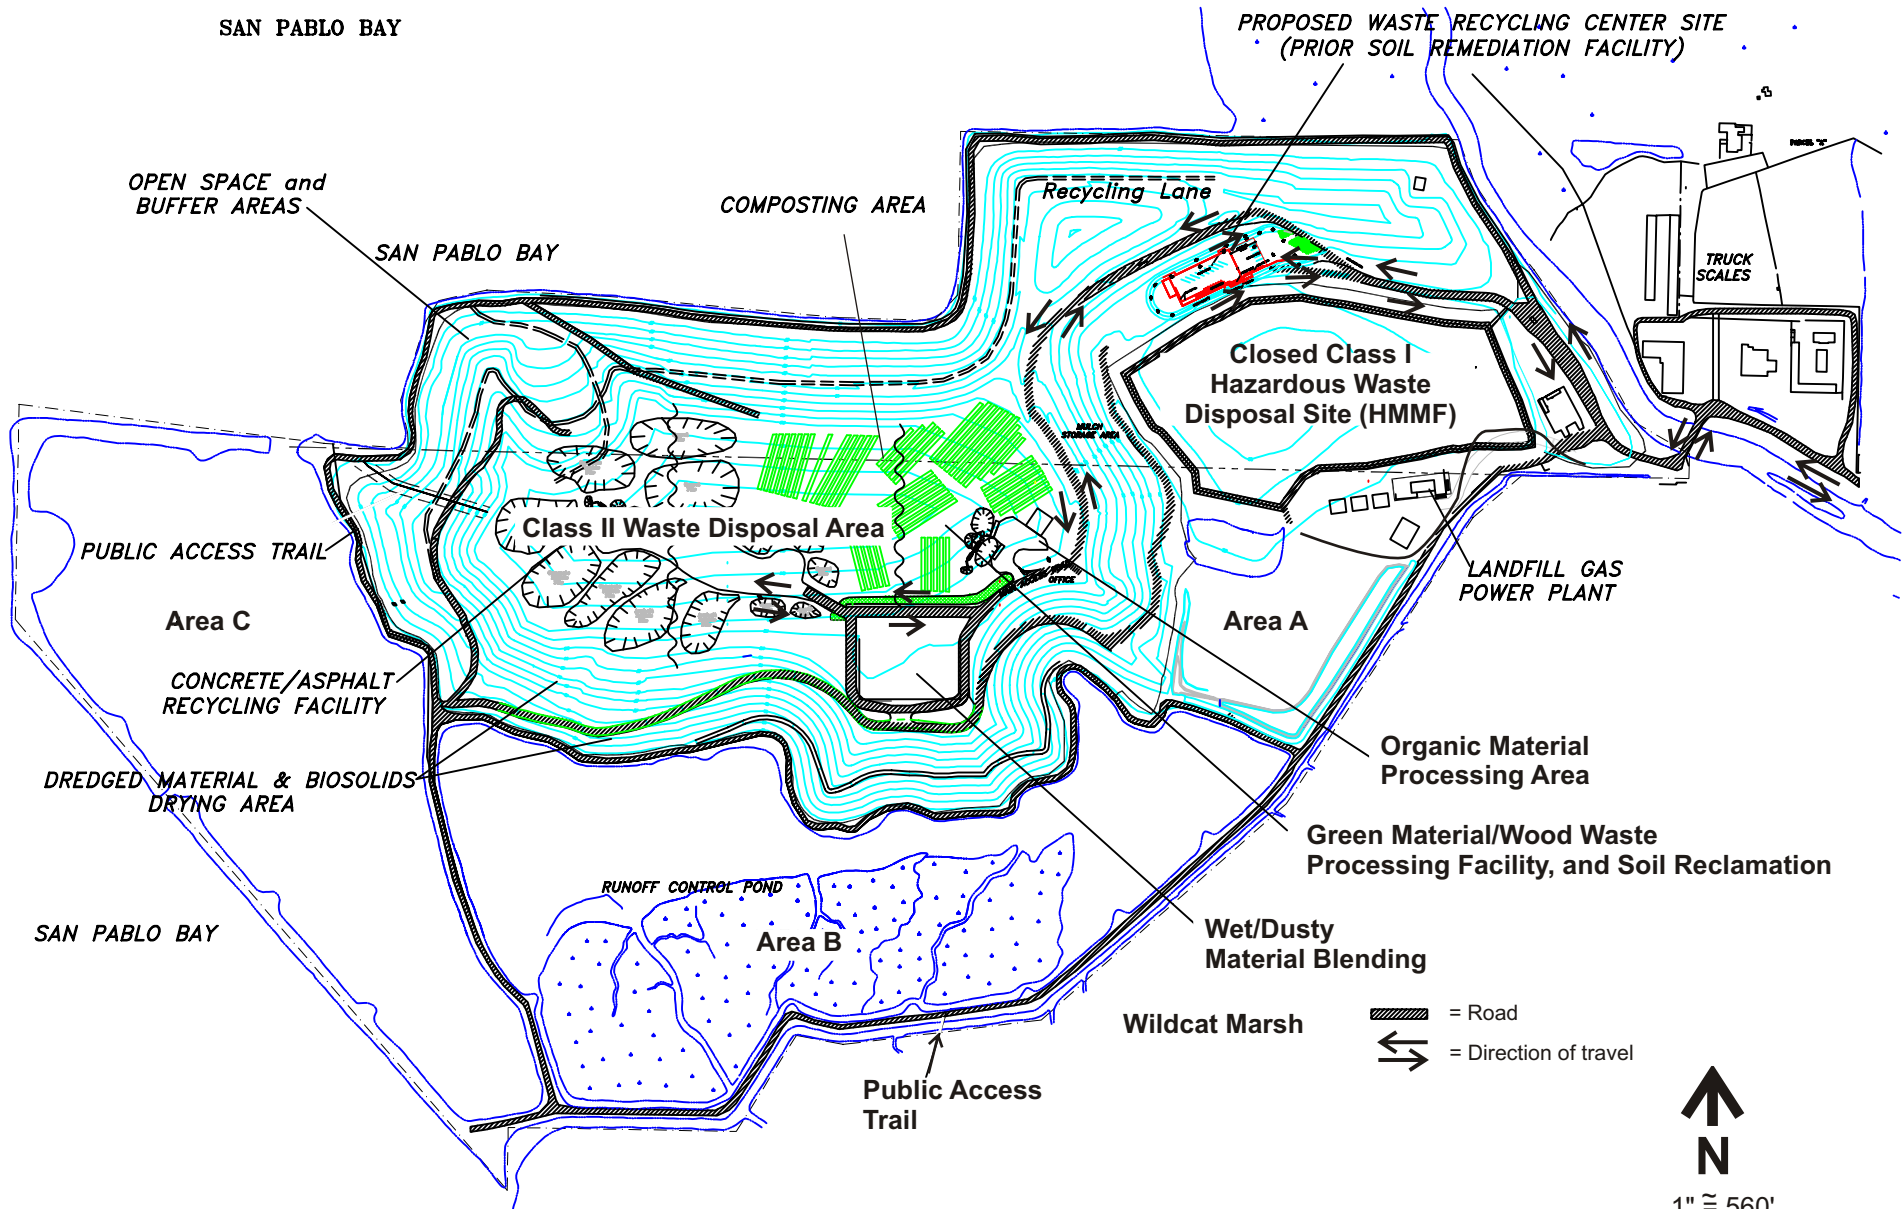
Existing and Proposed Building Locations On Site (Revised)
